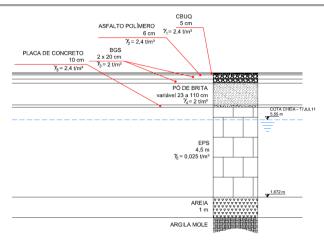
Cross-section of embankment 3 (Souza, 2018)
